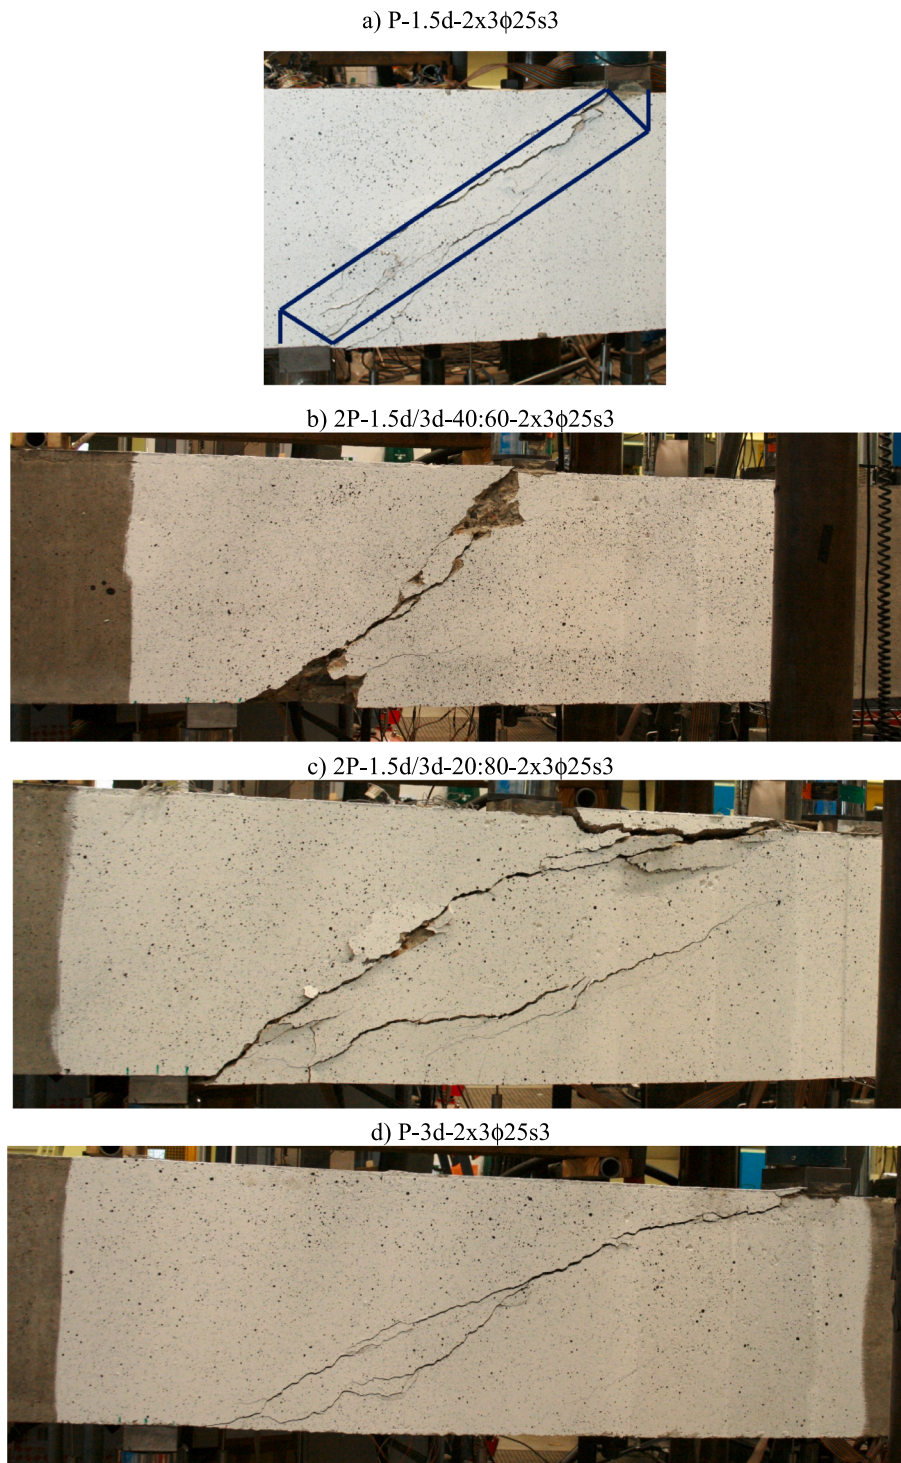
Final crack patterns for each beam with 8-mm stirrups at 300 mm centres.
